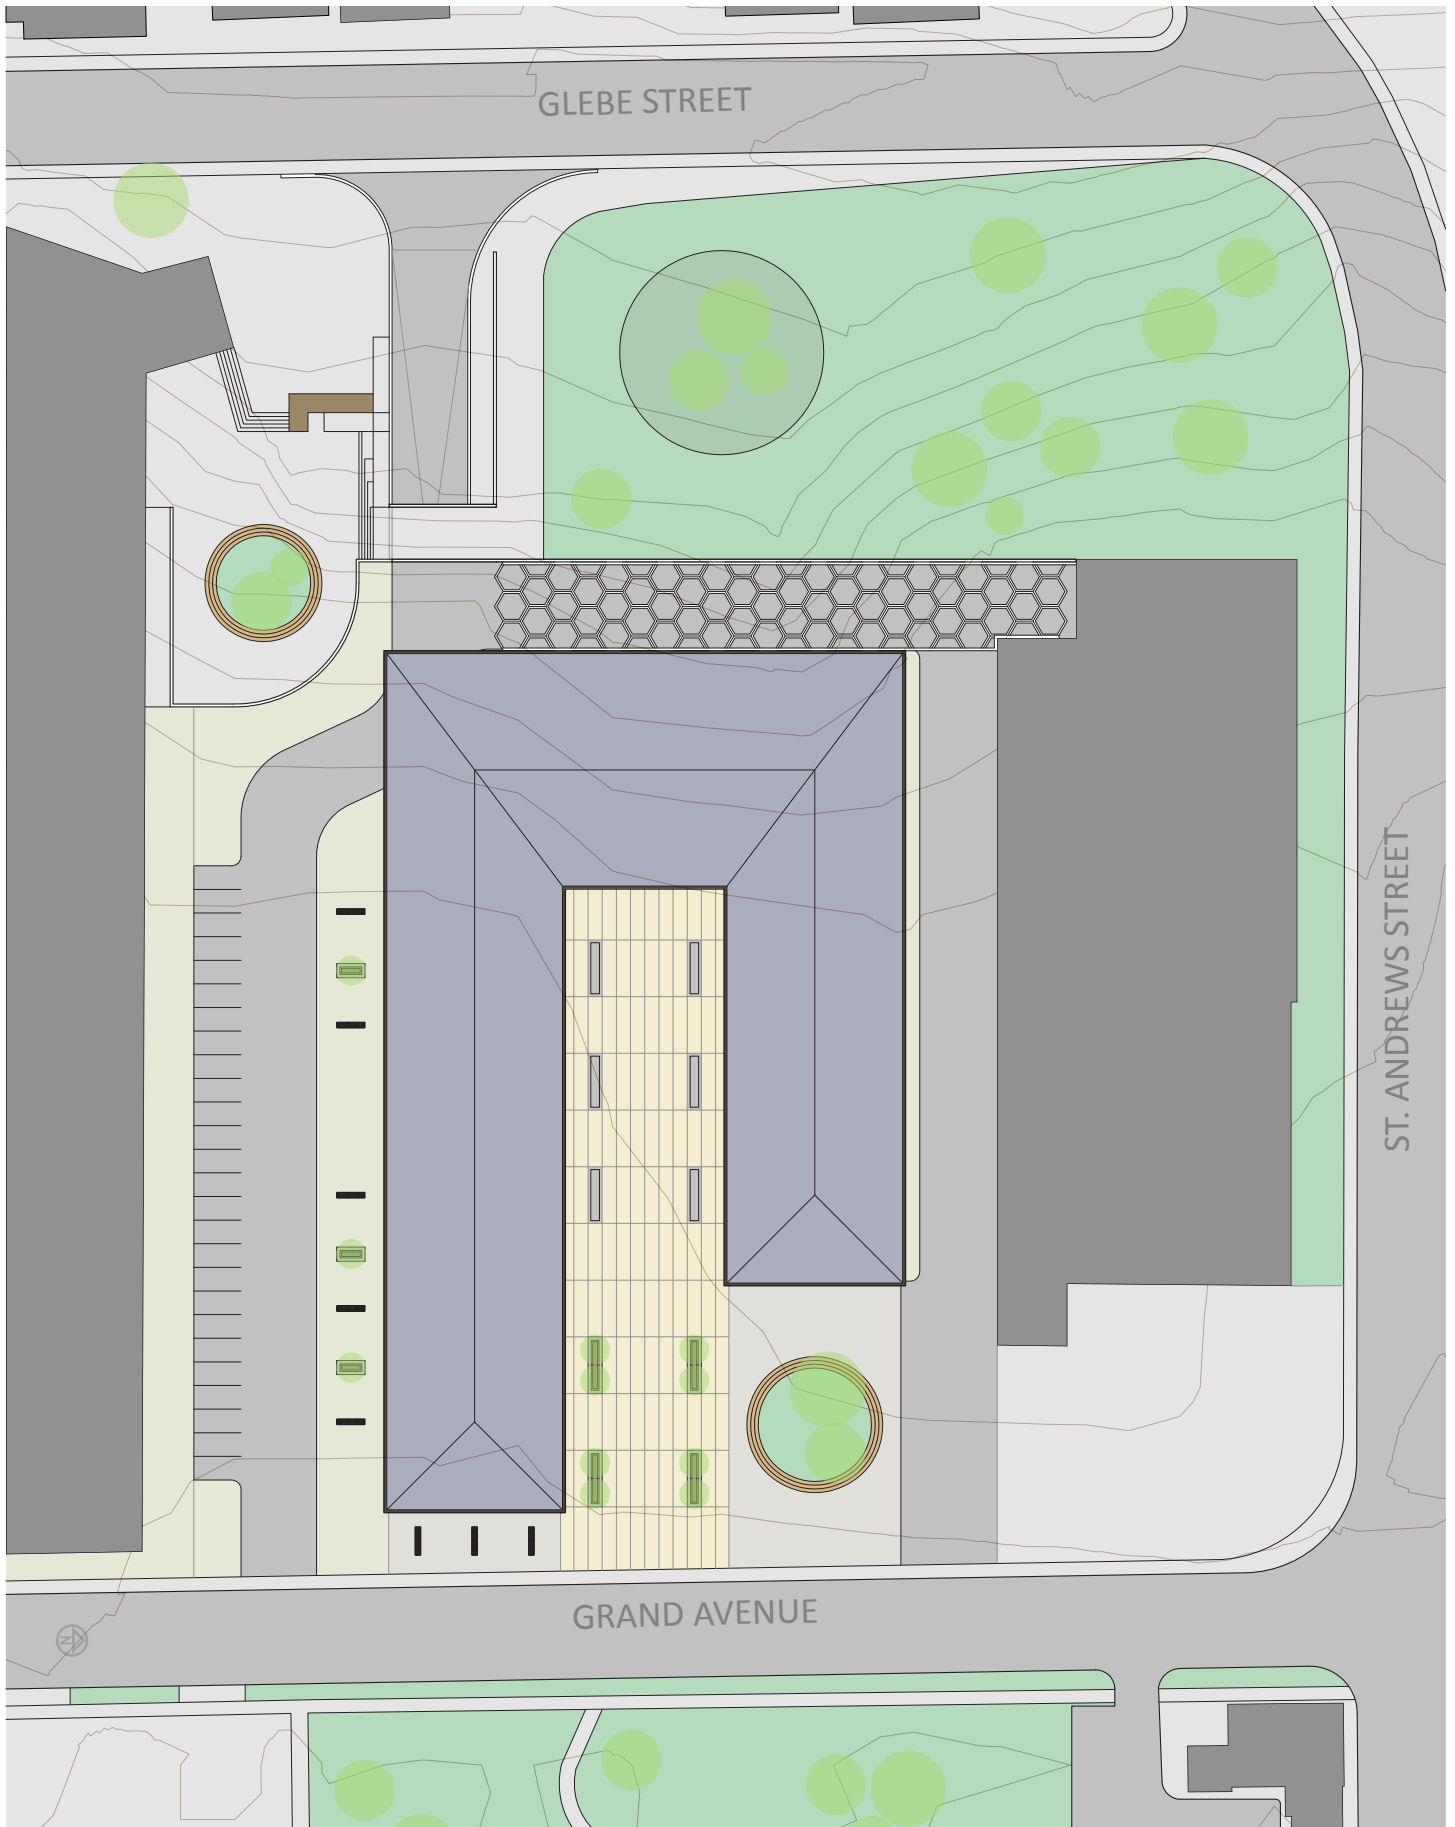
Siteplan of Galt Place stoa (1:800).
